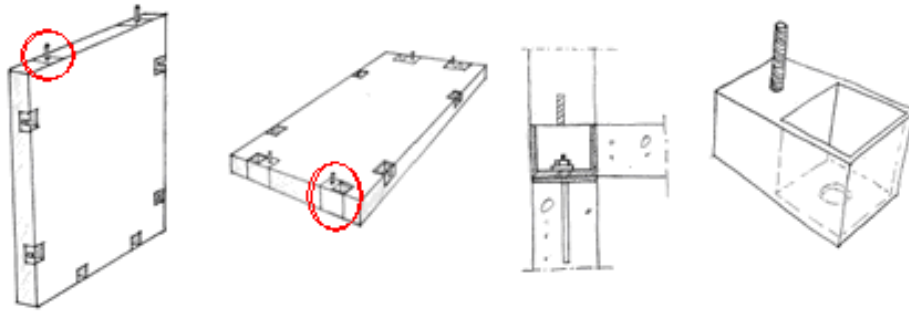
Connection used to connect floor elements to wall elements, Consolis (2007).
